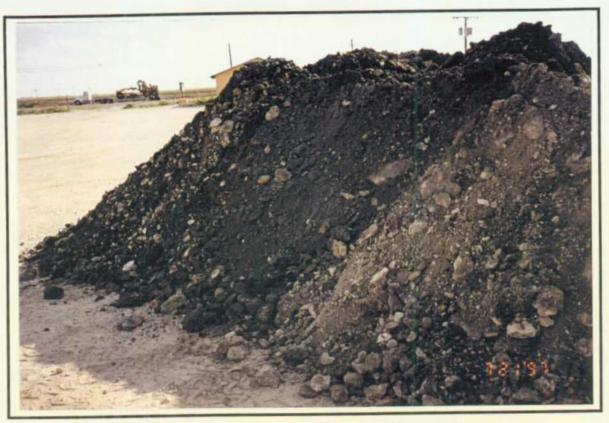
Typical impacted soil excavated from Northeast wash bay/seepage pit.
